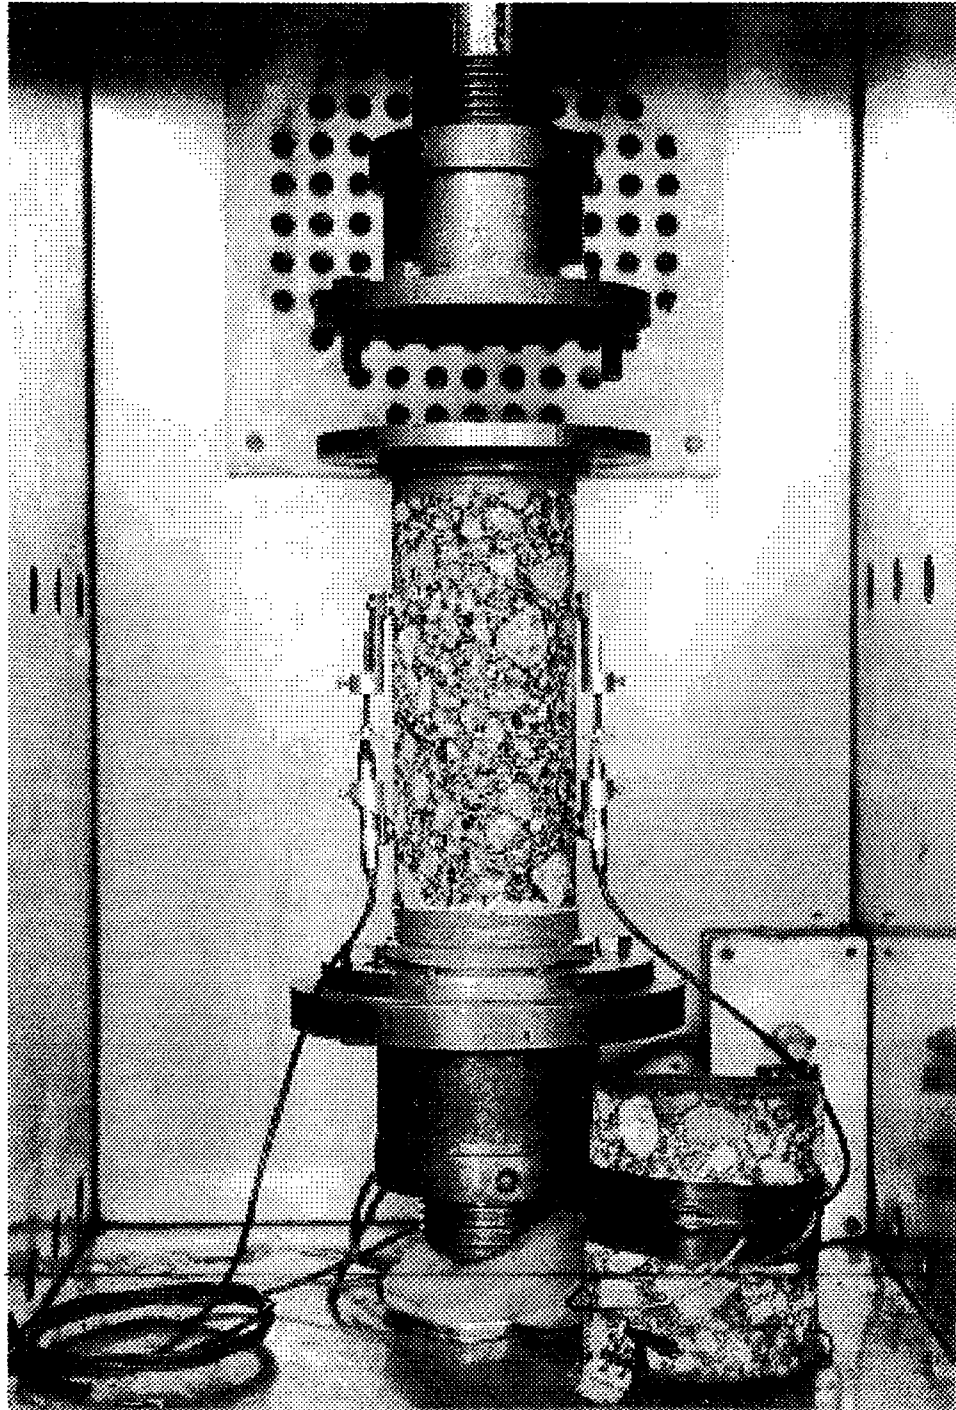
A Cylindrical Specimen Fixed in Position Ready for Fatigue Testing
